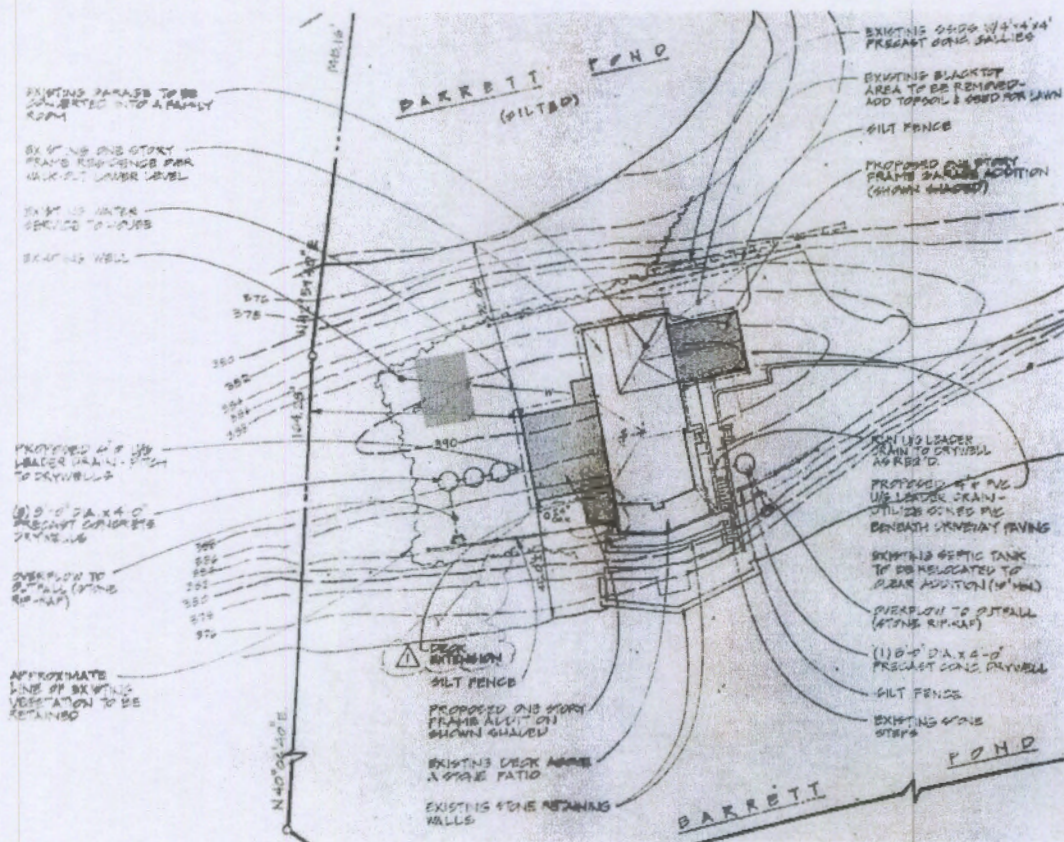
Detail from site plan for 54 Lyons Road showing approximate location of Greenhouse marked in green
